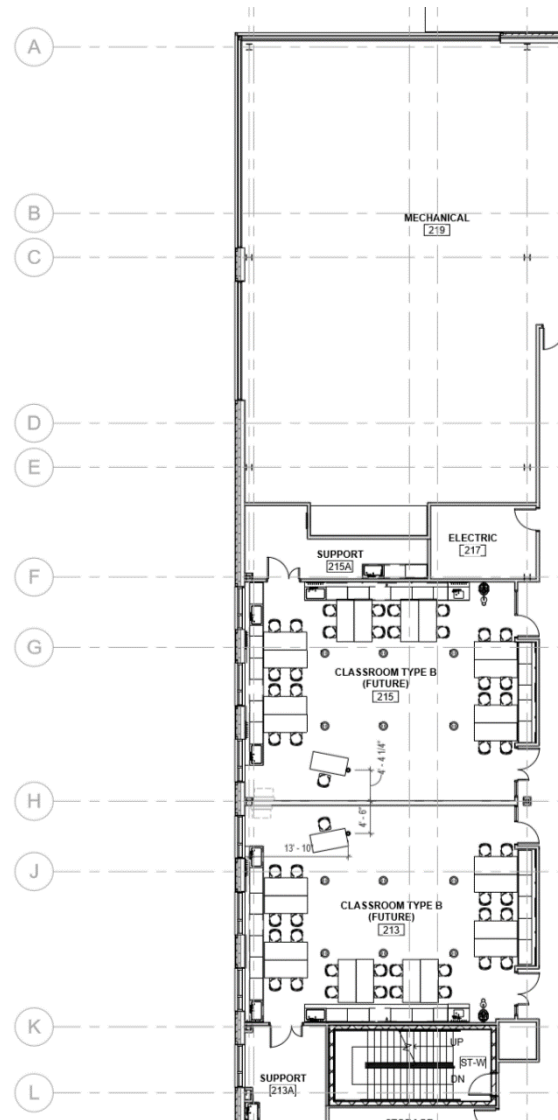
Partial Plan of the Second Floor of the New Engineering Building
